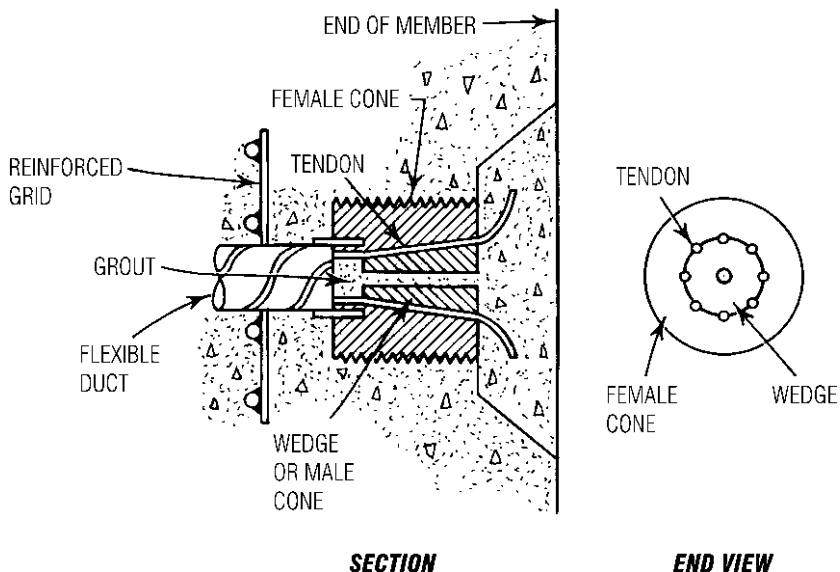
Conical wedge anchorage for prestressing wires.
